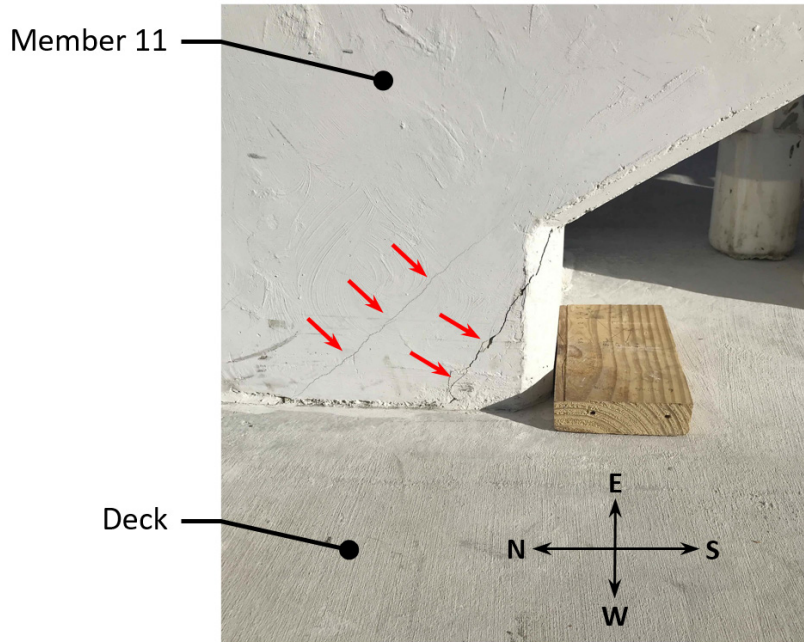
Photograph showing cracking at southwest corner of truss member 11 near where it met the deck. Captured on February 26, 2018 at 8:38 a.m. Corresponds to Bridge Factors Factual Report Photo 43.
